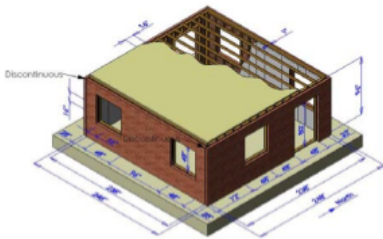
Full-size, wood-stud frame structure with sheathing, ties and clay masonry veneer, gypboard inside
